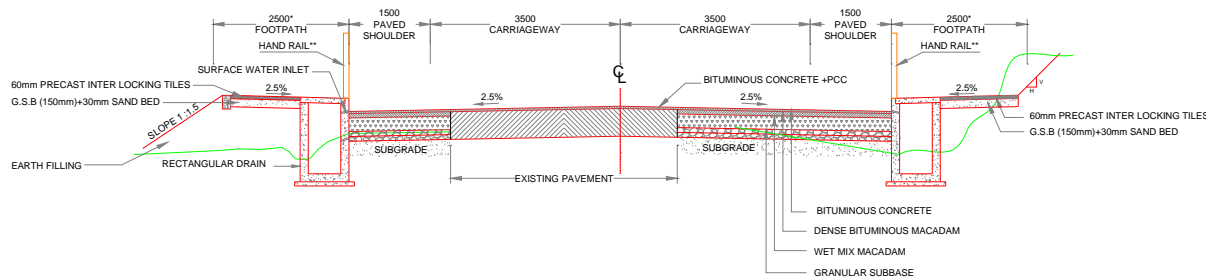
TYPICAL CROSS SECTION- TYPE-1
